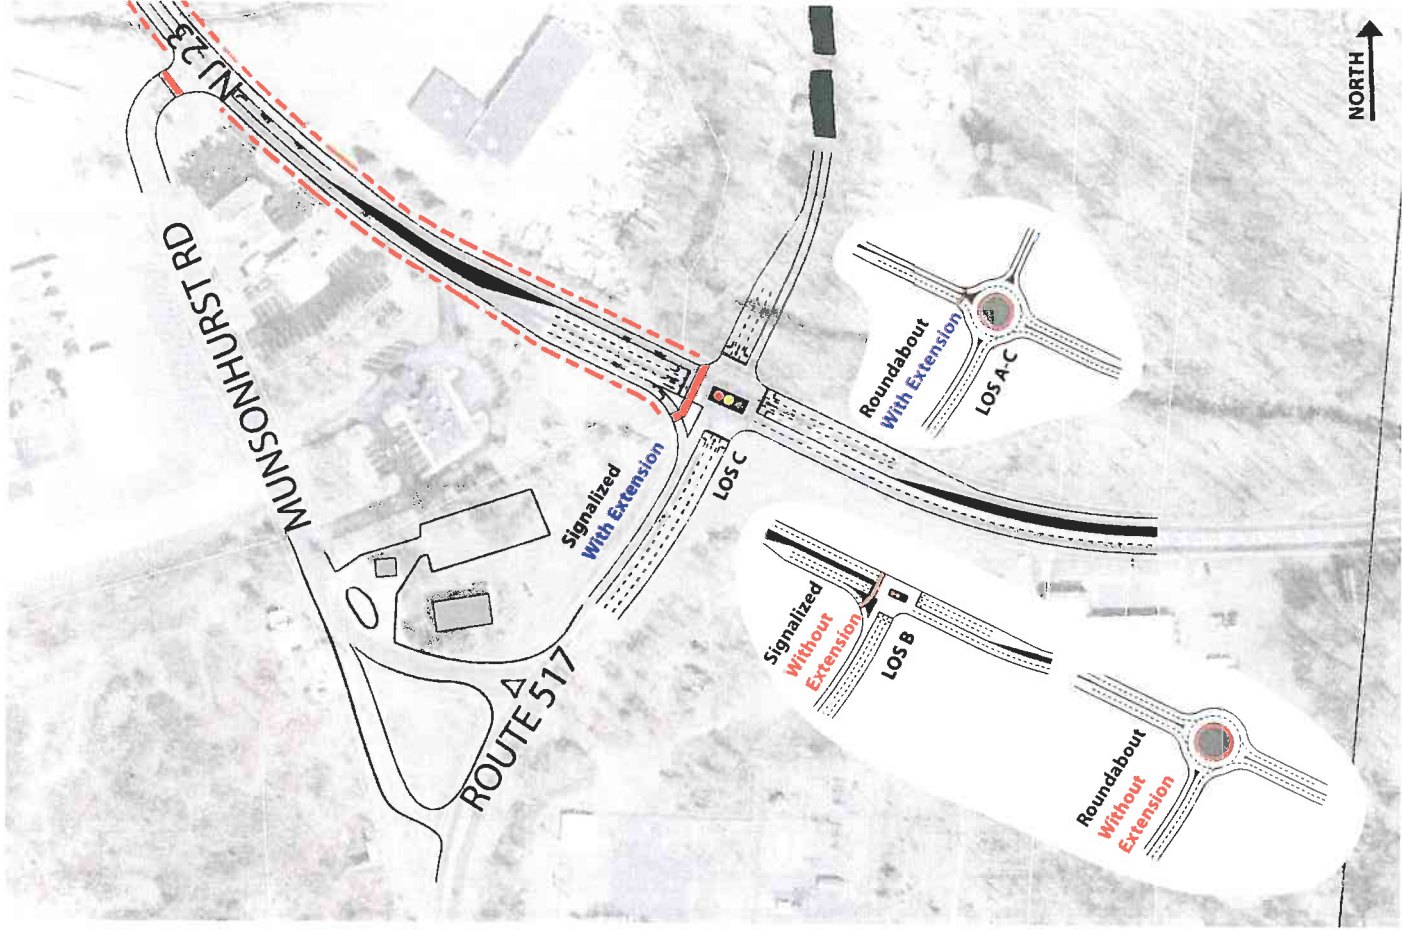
Munsonhurst Road/Route 23 Intersection Options
